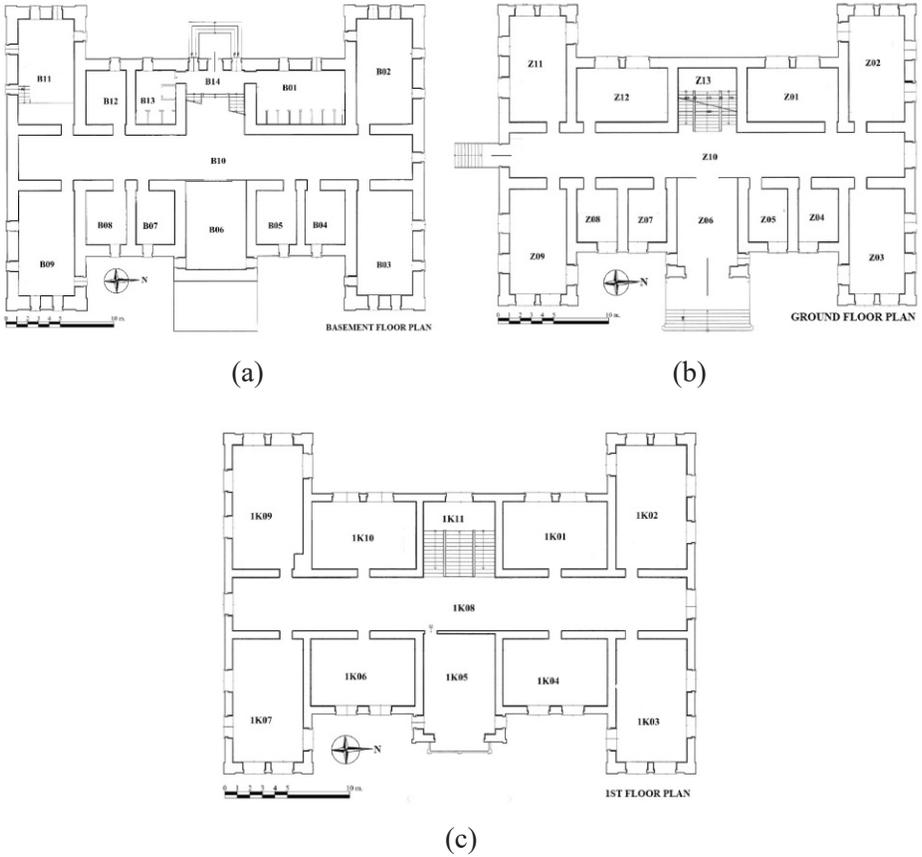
Gazi Primary School basement (a), ground (b) and 1st floor plans (Çelemoğlu and Atıcı, 2021)
